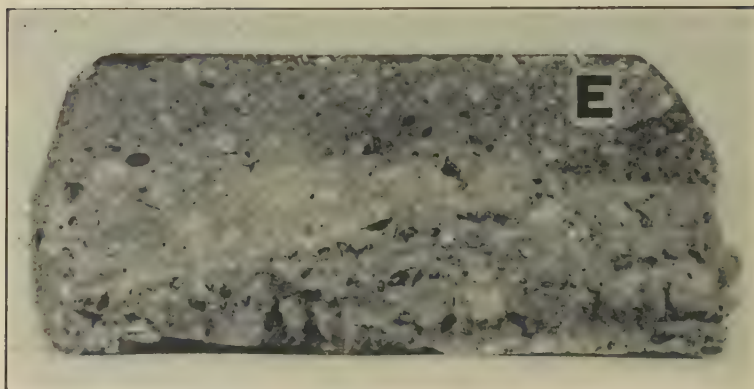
SAWED SECTION THROUGH PANEL NO. 5, A SLAB WITH A 1-IN. TOPPING OF CEMENT, SAND AND GRIT PLACED MONOLITHIC WITH SLAB.
